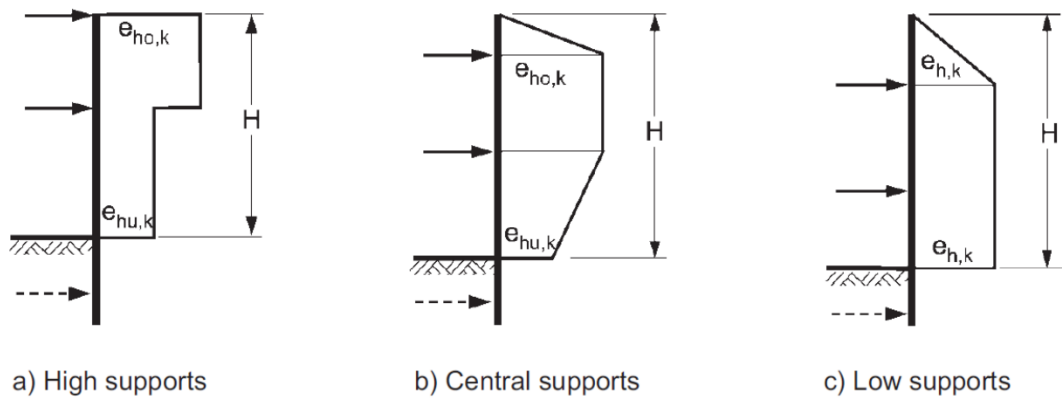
Pressure diagrams for double-supported sheet pile and concrete walls after EAB (2014)
